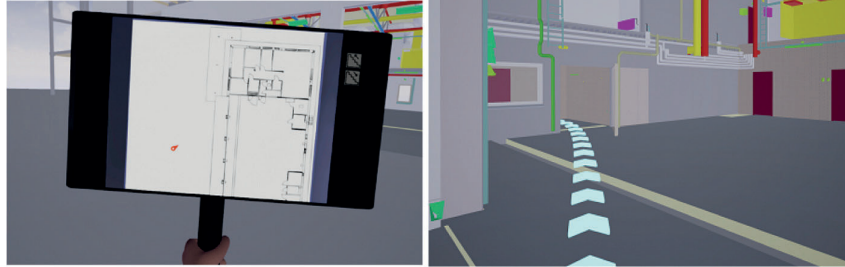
The floor plan (left) and route instructions to a destination (right)
